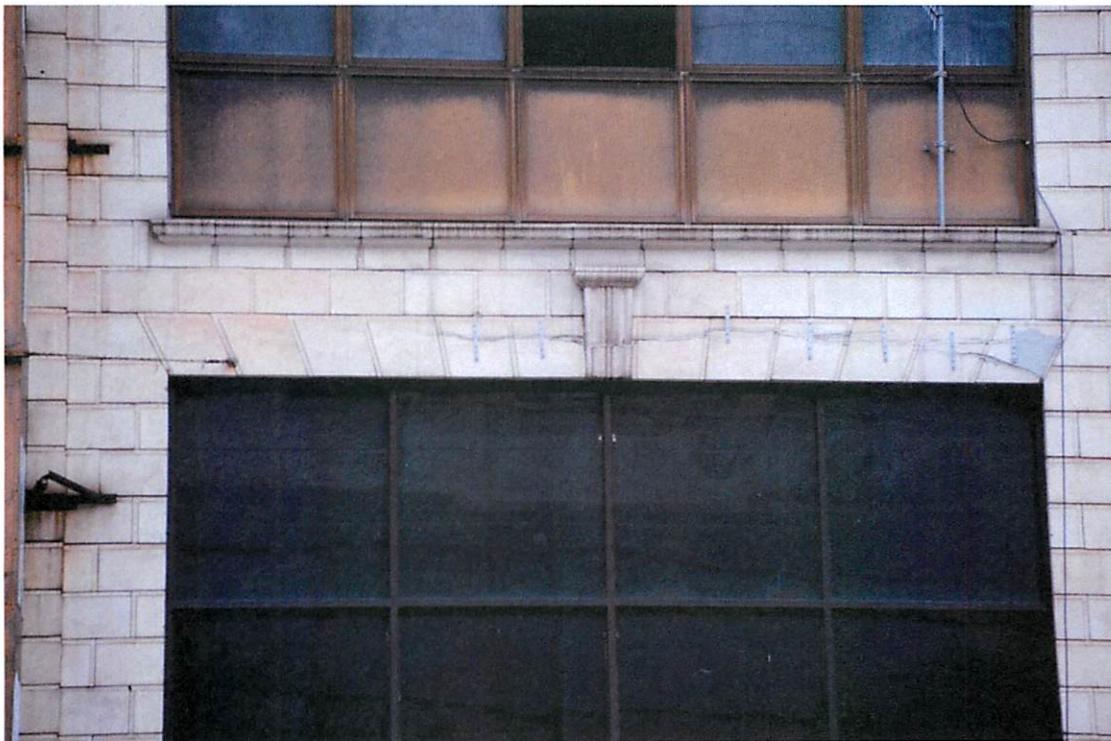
Typical repaired jack arches, loss of glazing, water staining showing infiltration at sills
